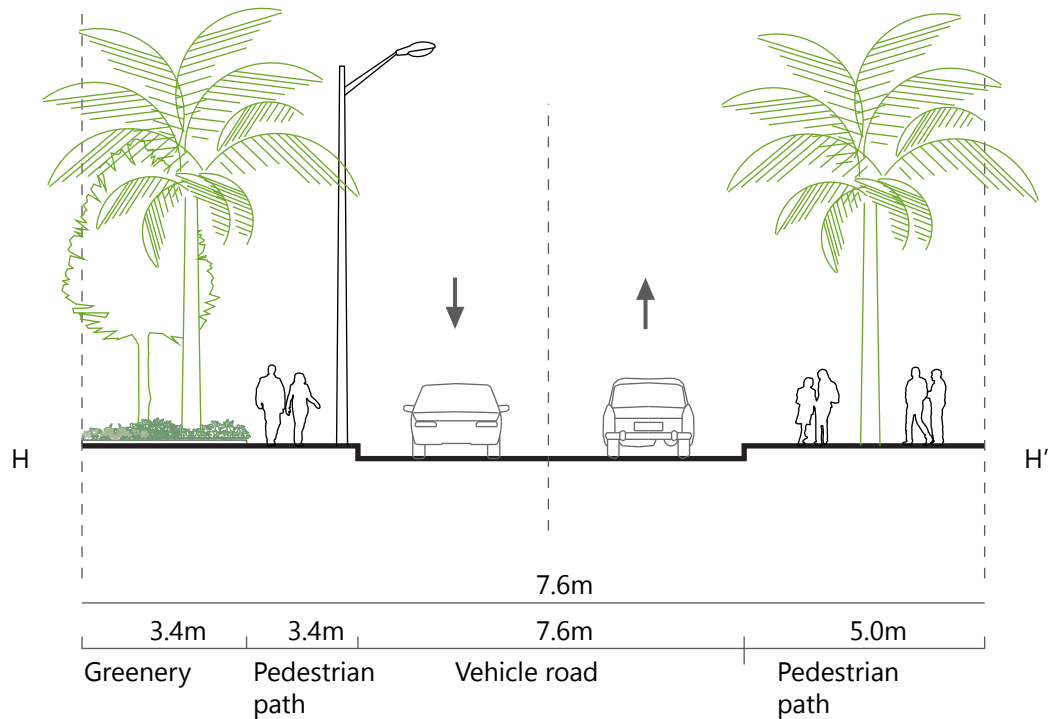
Hayam St. (Hotel zone) Section Scheme, Source: Author
